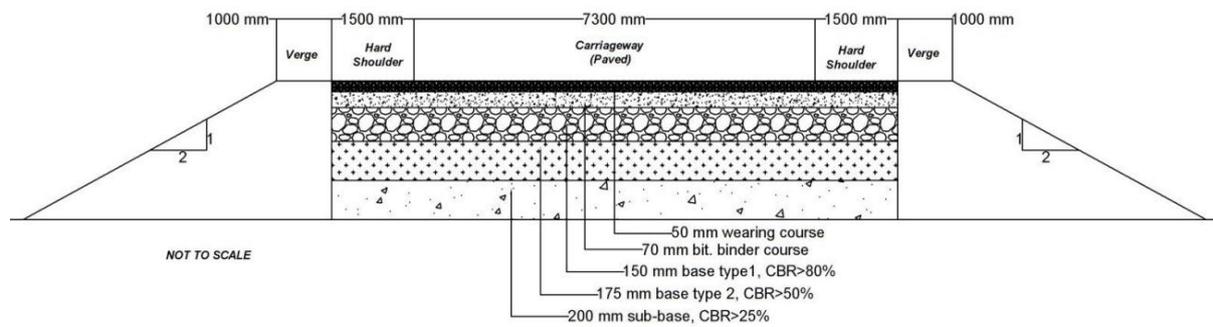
Cross section of proposed road (2-lane) on top of dike at inner side
